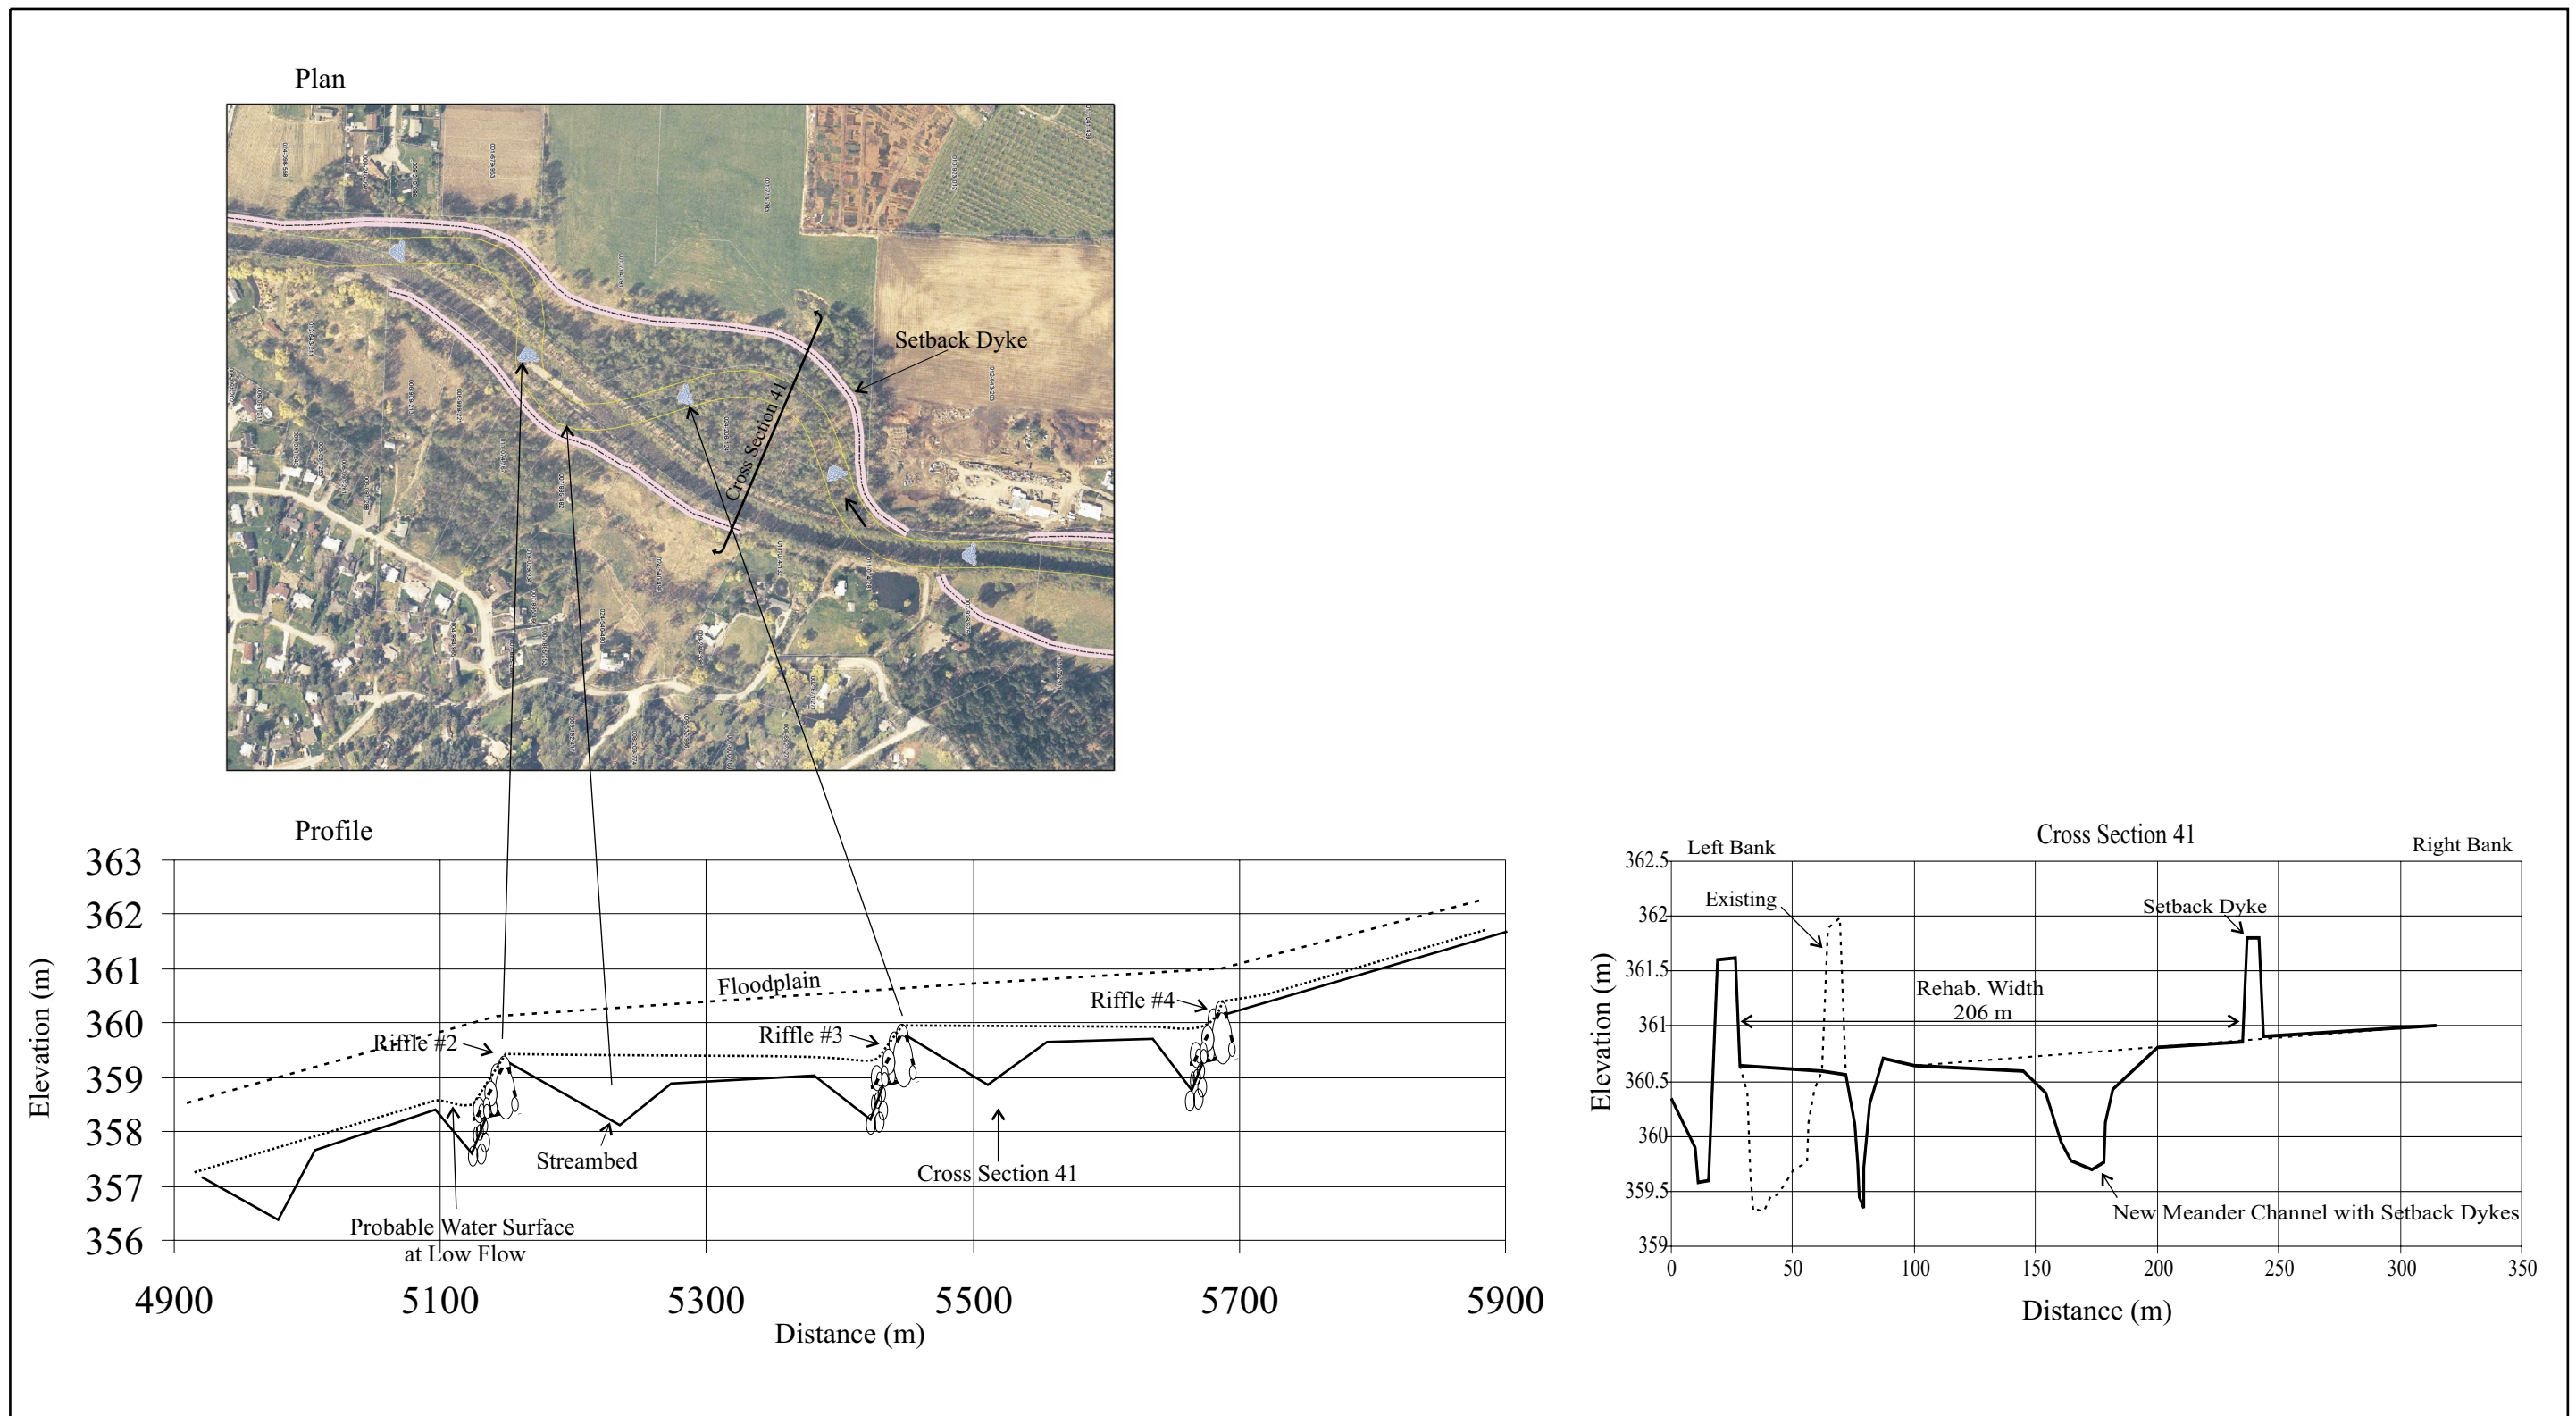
Plan, profile and cross section views of typical riffle-pool sequences in a proposed meander section of Mission Creek.
